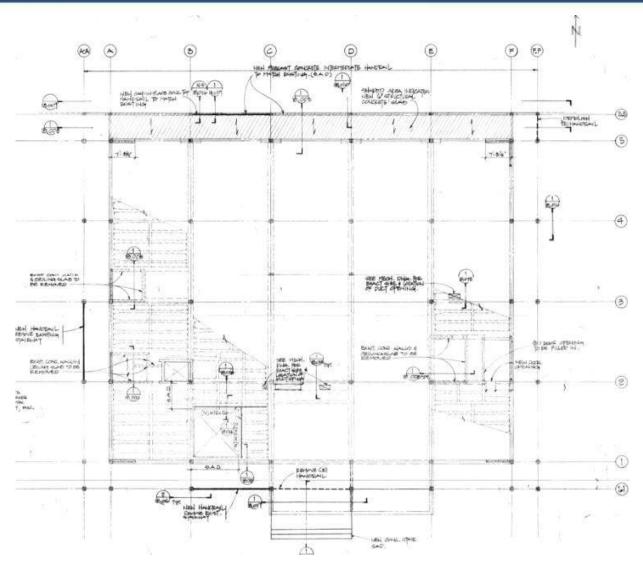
1st Floor Framing Plan, 1986 Structural Drawings
